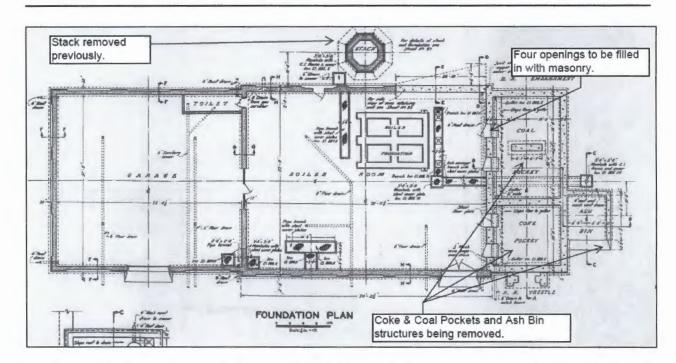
, "Coal Pocket, Boiler House & Garage - Plans and Sections "" Drawing 94, Bid Package No. 29; W. H. Dittoe, Chief Engineer, April, 1930 (partial view)
